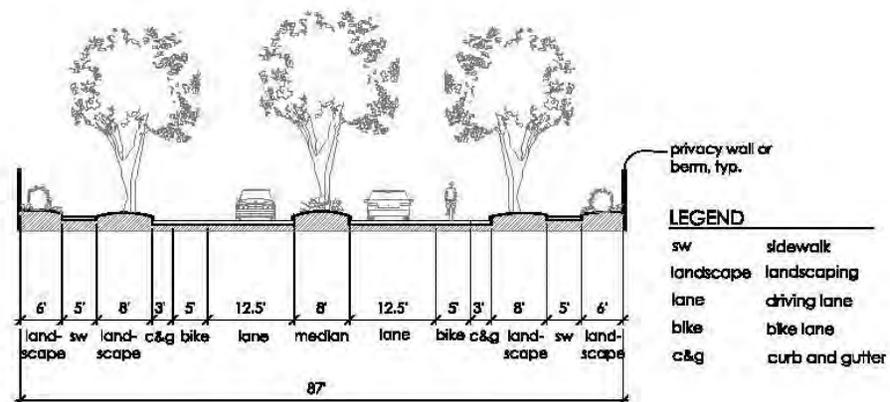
Neighborhood Residential Entry Plan and Elevation
